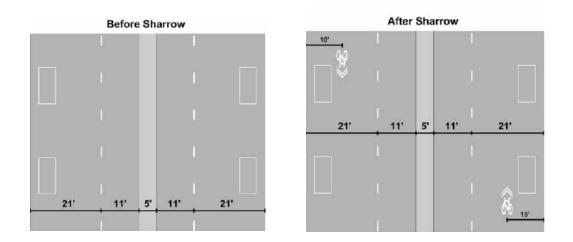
Width of the roadway section before (left picture) and after (right picture) adapting sharrows (Hunter, et al., 2011)
